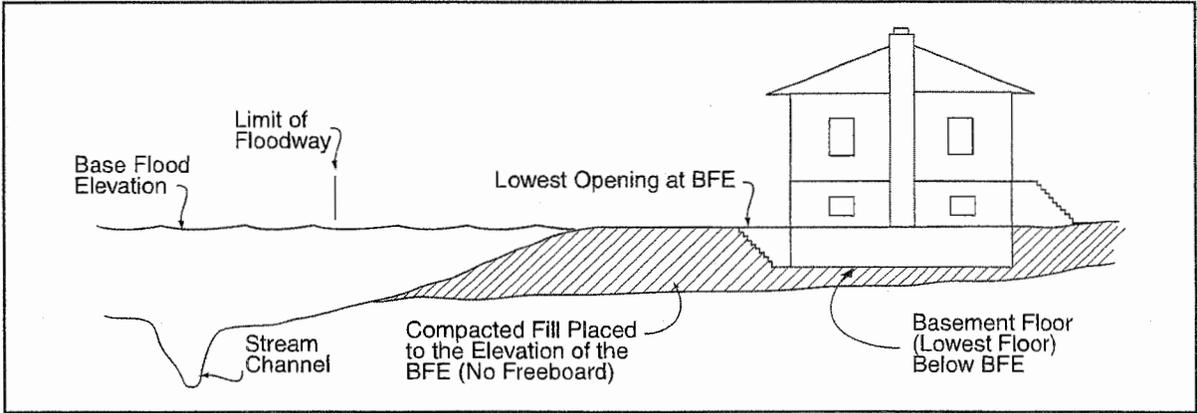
Basement foundation with lowest opening at the BFE. The basement is exposed to flooding from any flood greater than the Base Flood.
